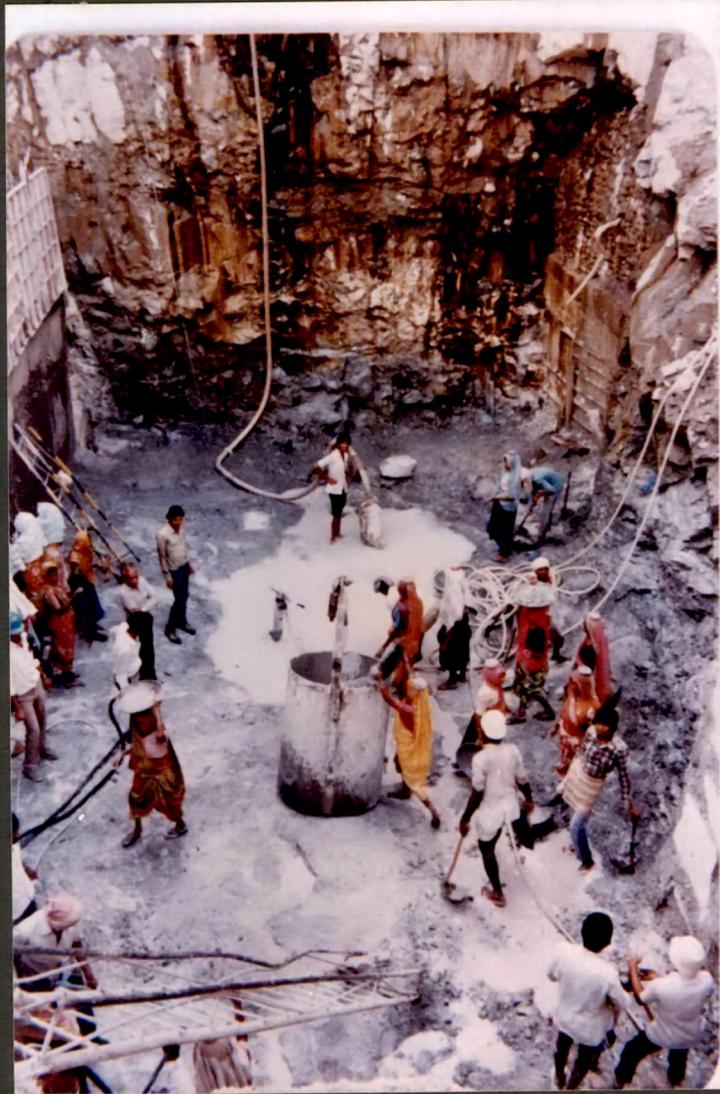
Treatment of upper argillaceous sandstone through drift and shaft in the foundation of spillway block, Sardar Sarovar (Narmada)Project
